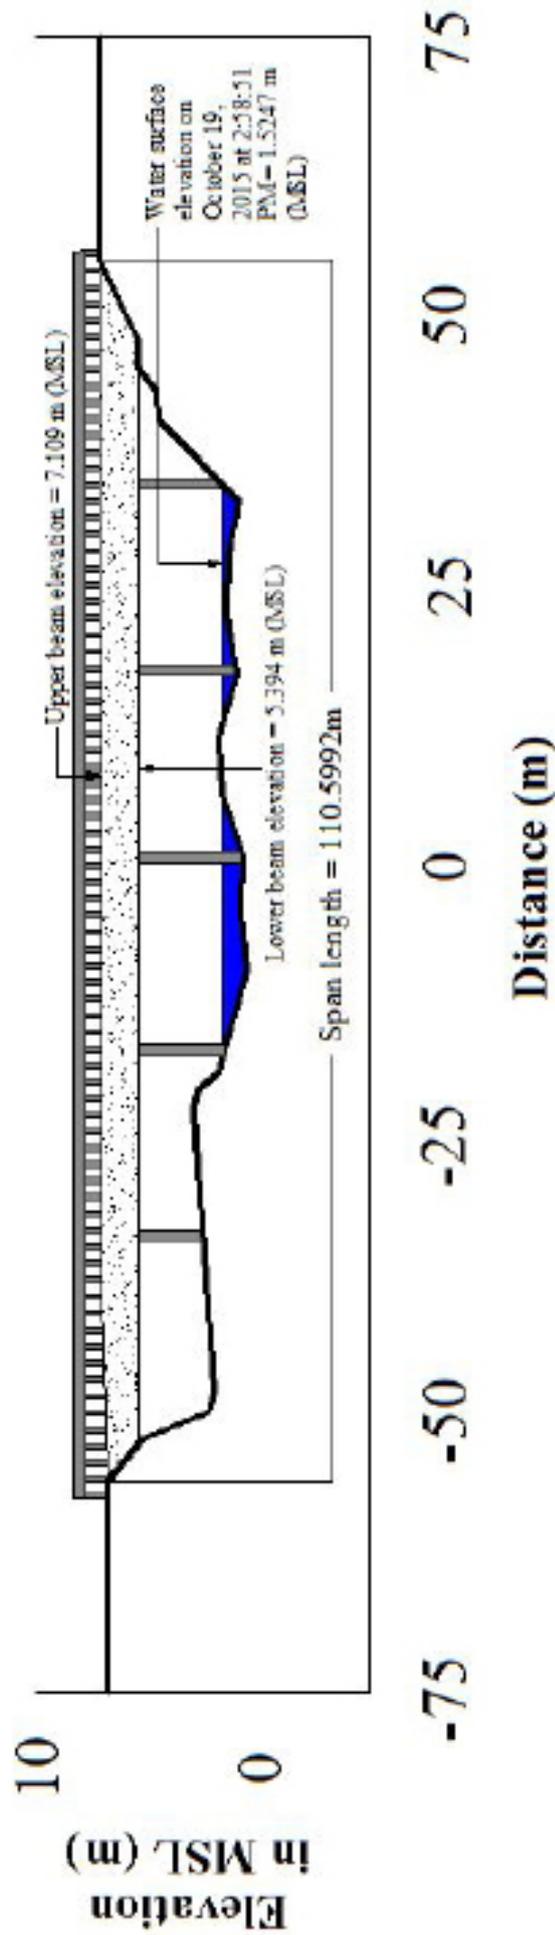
Talisay (also known as Yabaan) Bridge cross-section diagram
